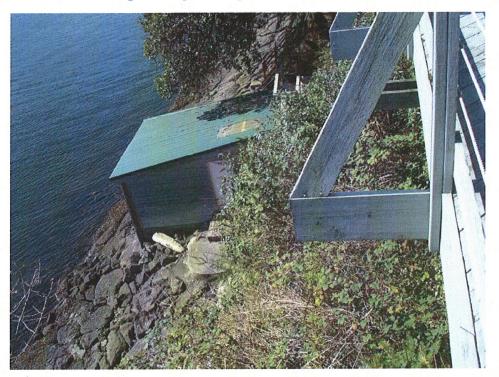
Looking west at vegetation below deck, beach and boathouse.
